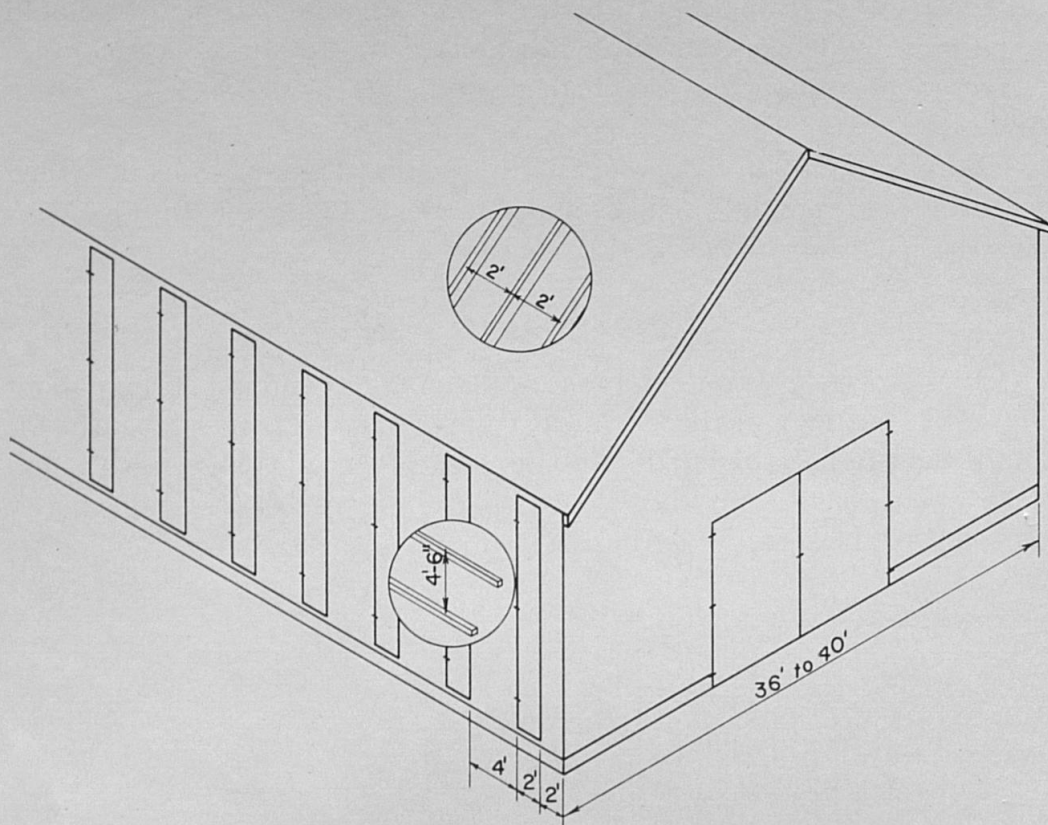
A well-built barn with these dimensions, adequately ventilated, and properly located can improve curing conditions.
